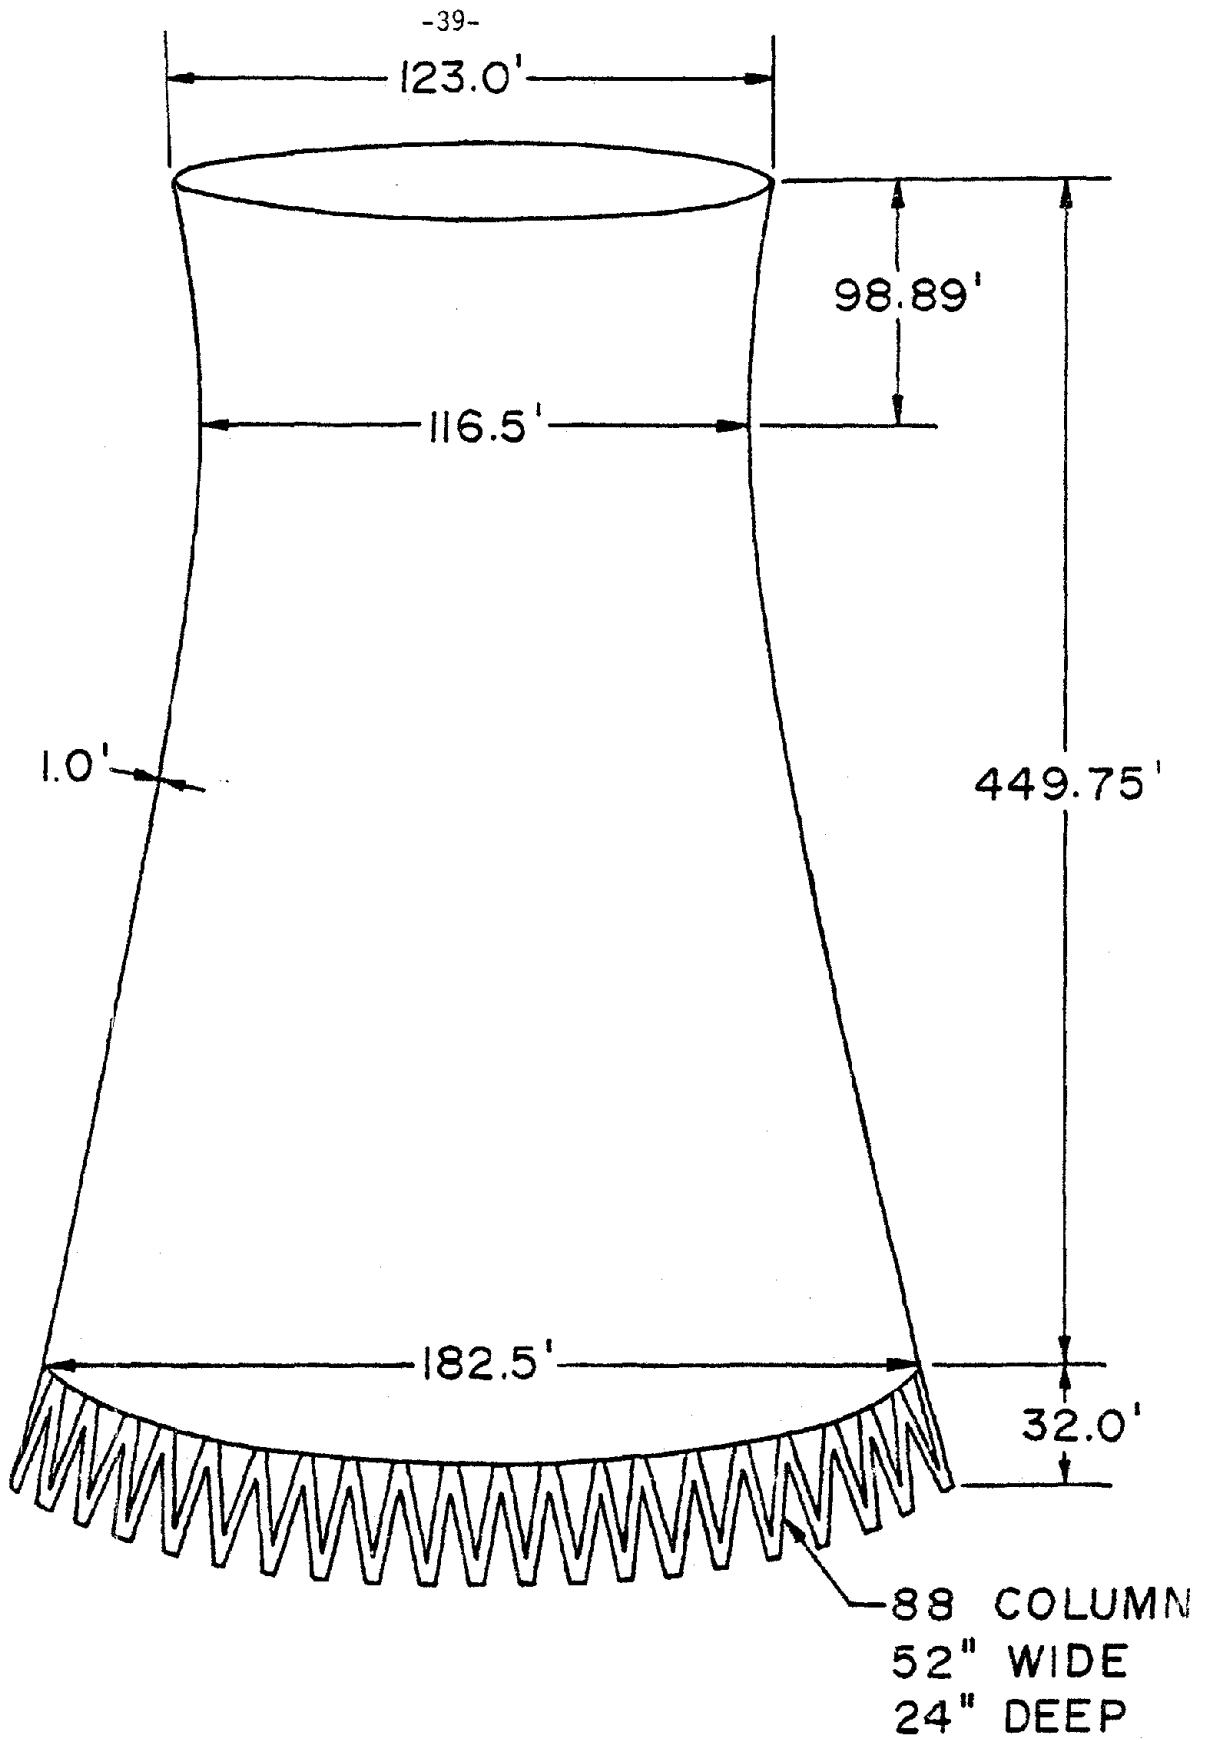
An Example of a Reinforced Concrete Cooling Tower with Discrete Column Supports.
